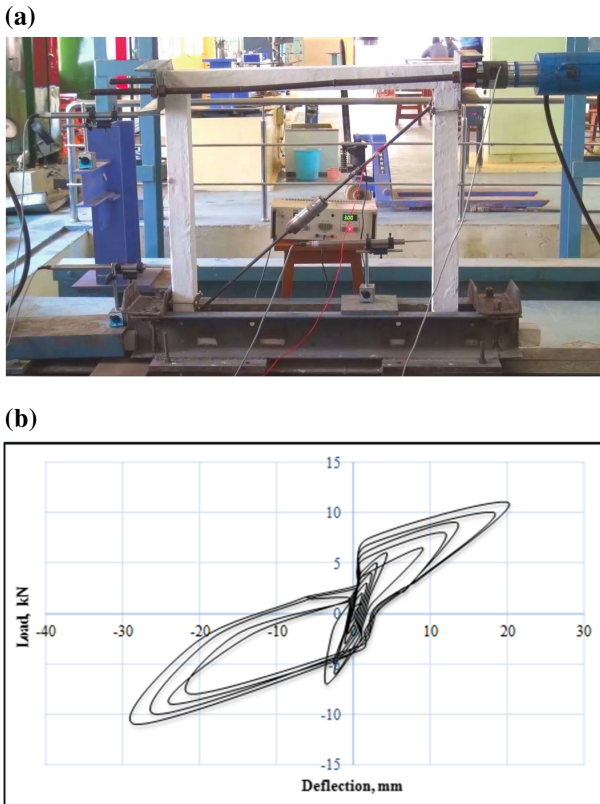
(a) Single bay frame with damper, (b) Load Vs deflection for bare frame with MR damper
